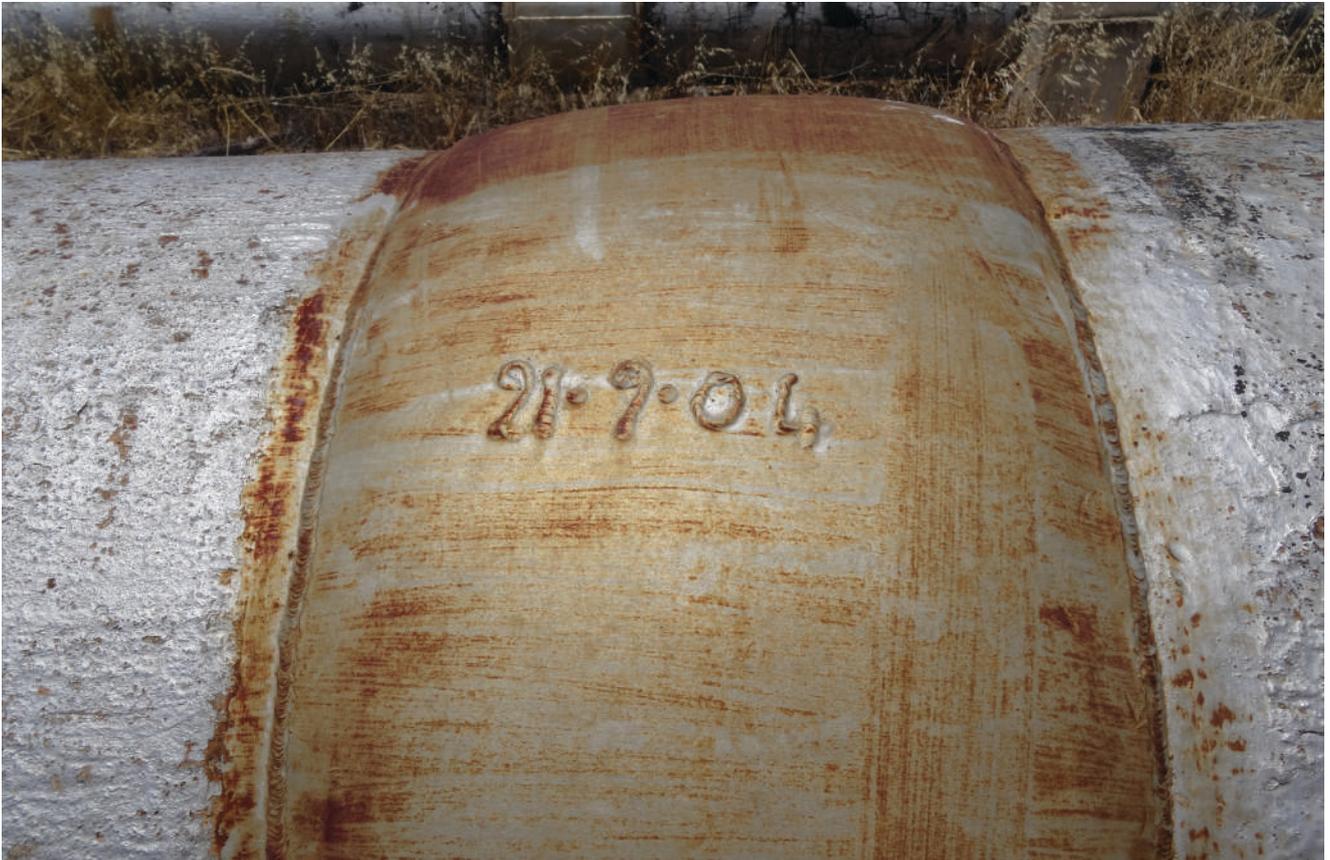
Beginning of section closest to Tammin townsite; welded detail
